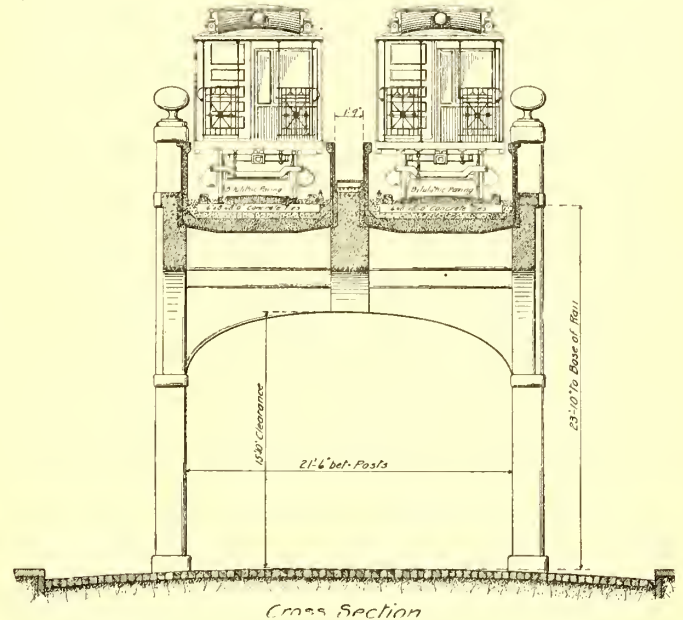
TRANSVERSE SECTION OF SUGGESTED CONCRETE STRUCTURE
